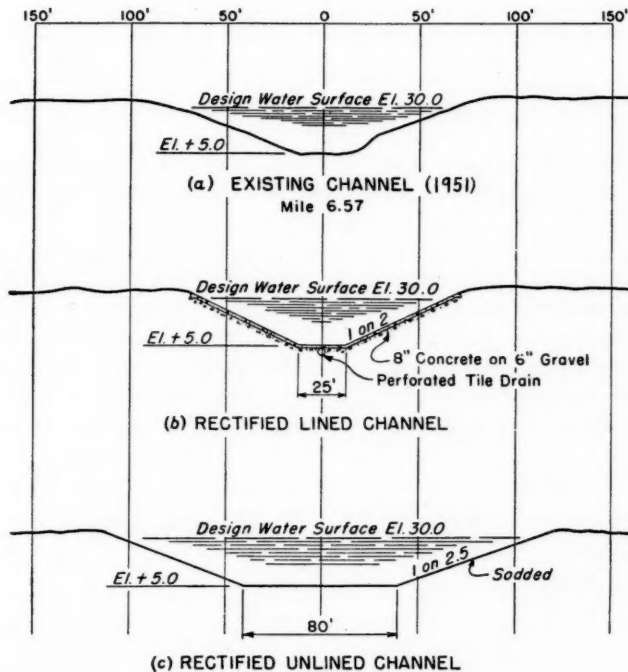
TYPICAL CROSS SECTIONS OF BRAYS BAYOU
